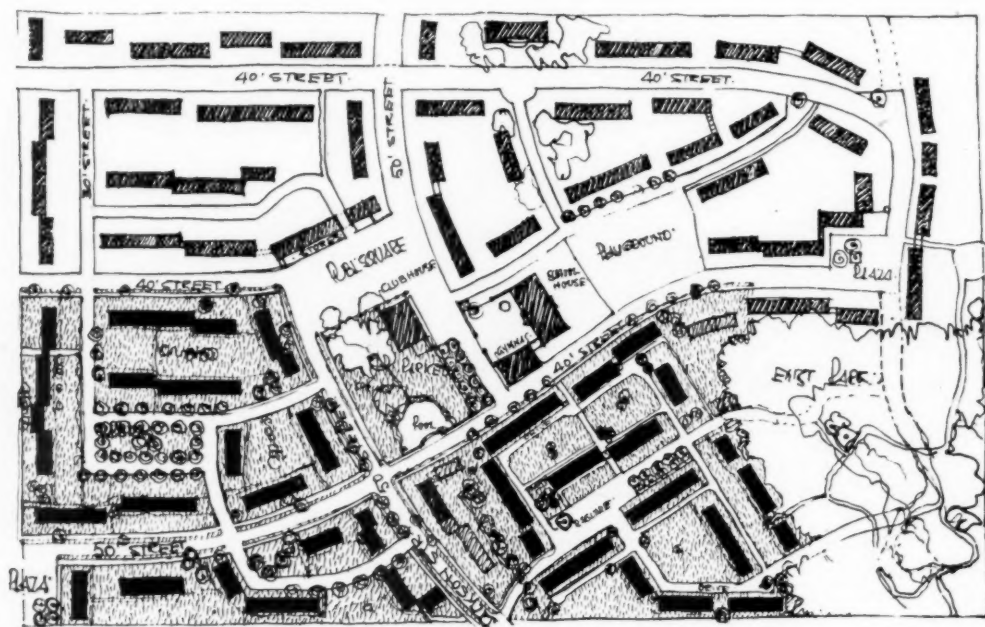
LAYOUT OF 40-ACRE TRACT. GENERAL PLAN
